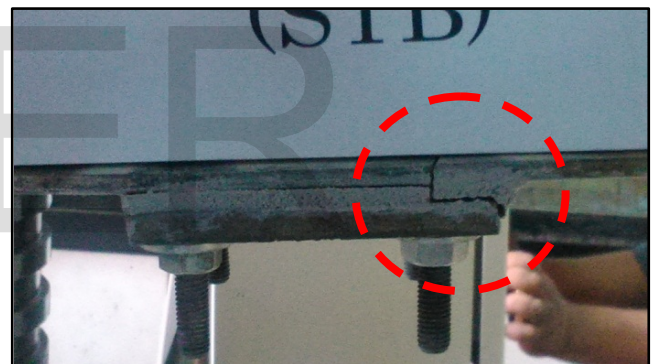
Bottom flange crack in the anchorage zone (STB)
